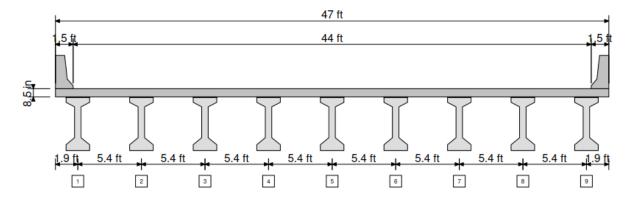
122-ft Span Length Bridge Geometry by Using K-4 Girder
